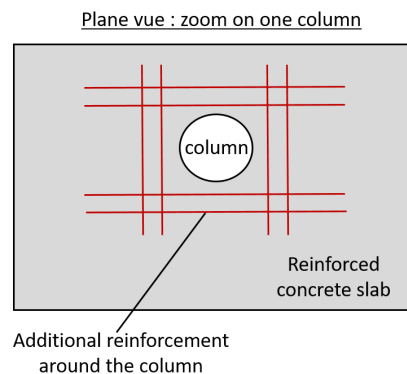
Procurement of a ductile behavior to slab through additional reinforcements.
